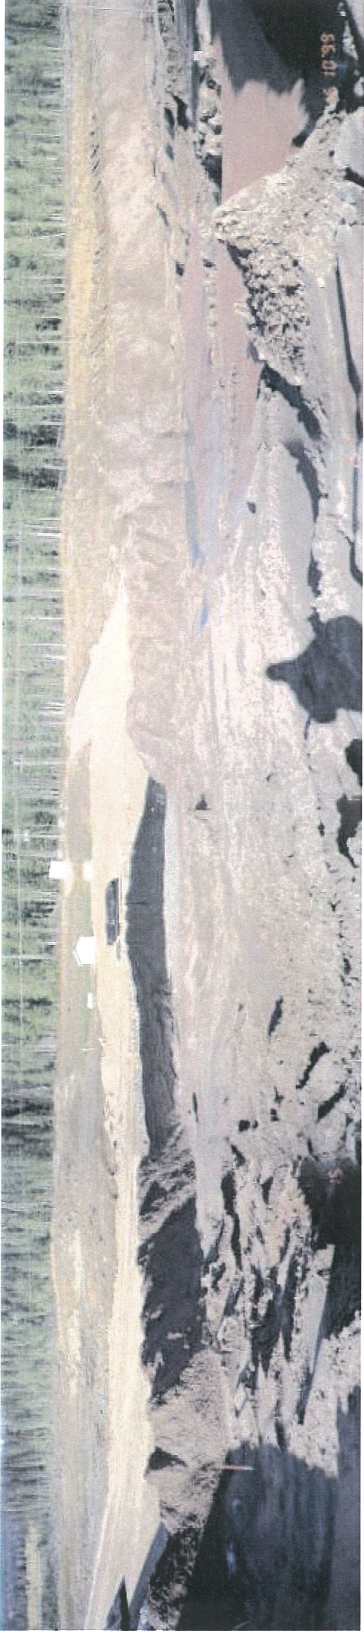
Downstream Trial – Construction of Phase II downstream berm.
